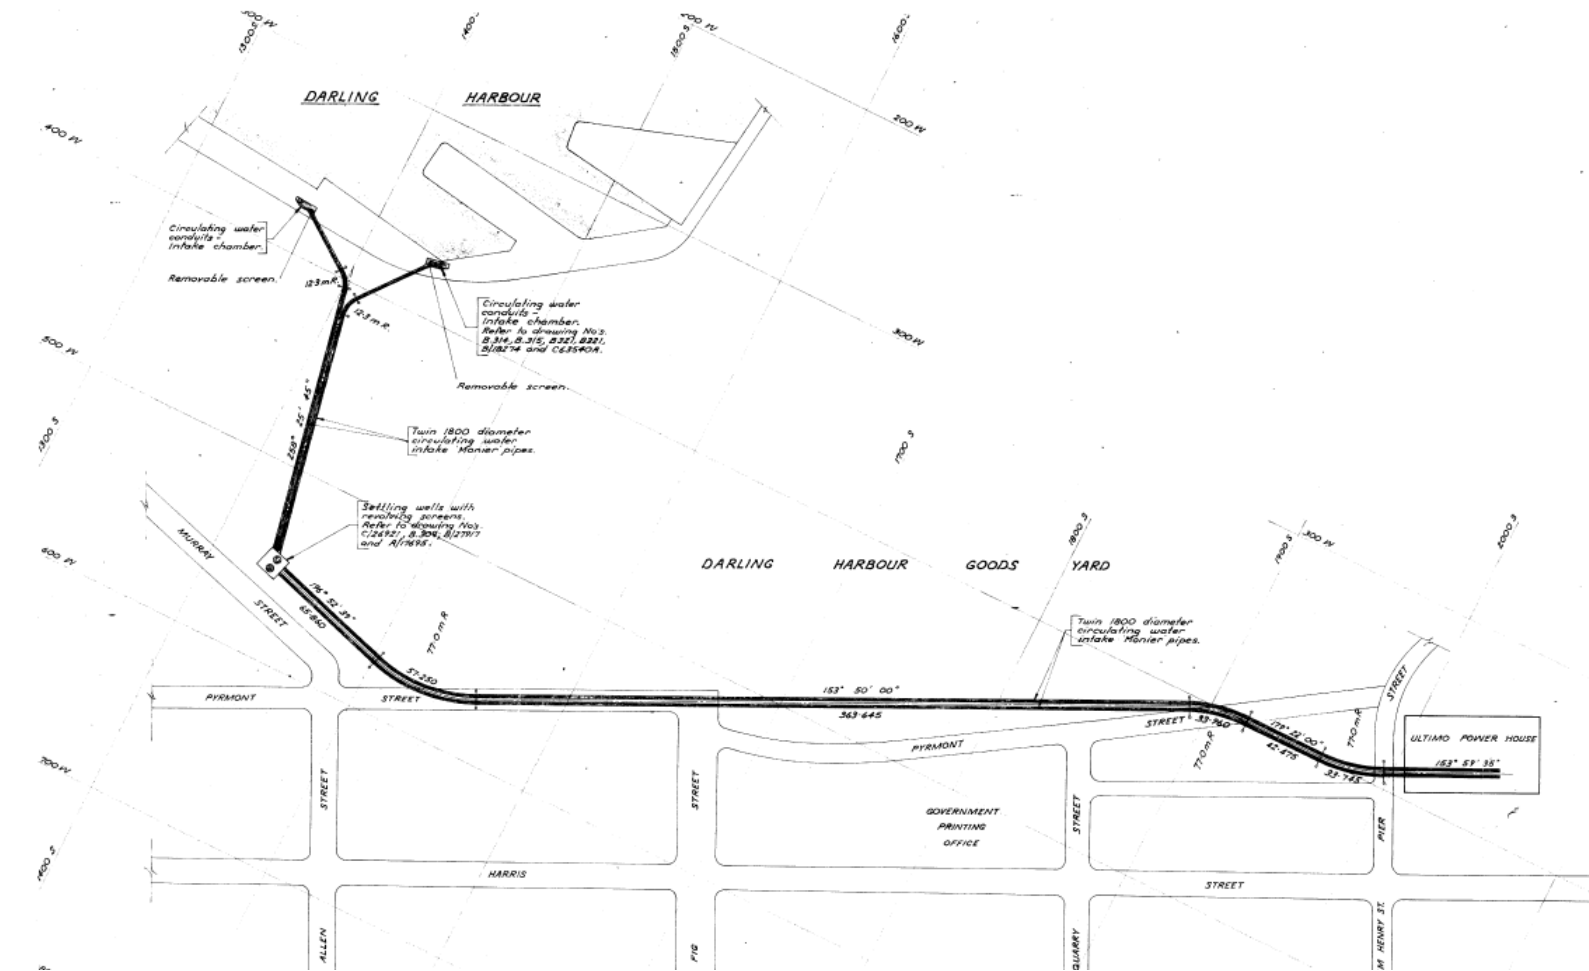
Power House Ultimo Plan of existing seawater conduits, drawn 1982 (Source: Powerhouse)
